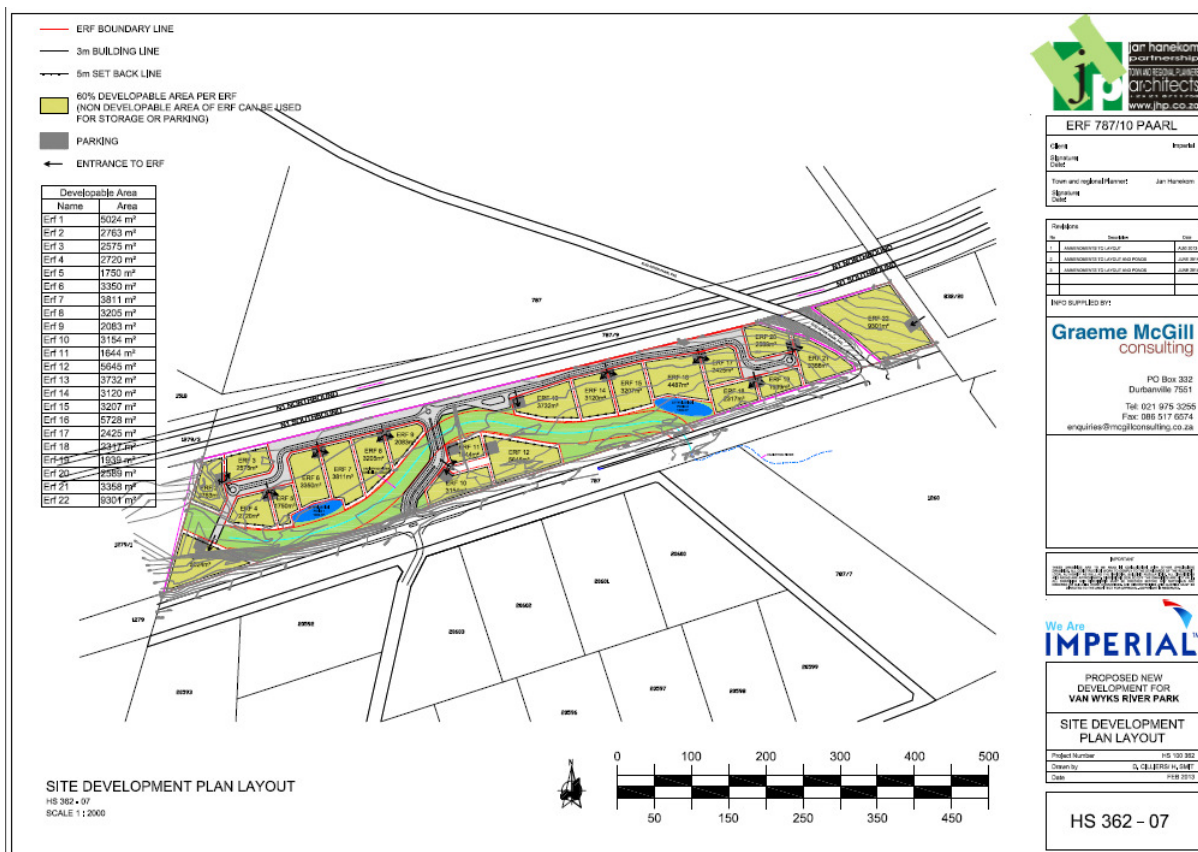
Proposed Site Development Plan Rev 2 June 2014 (Refer Drawing HS 362-07 by Jan Hanekom Partnership)
